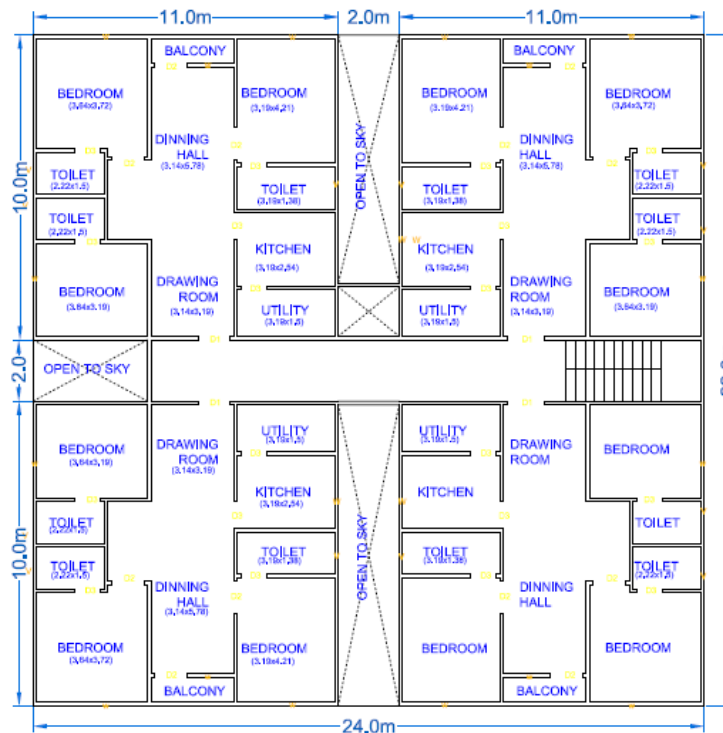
Typical Plan View of G+7 Residential Building.
